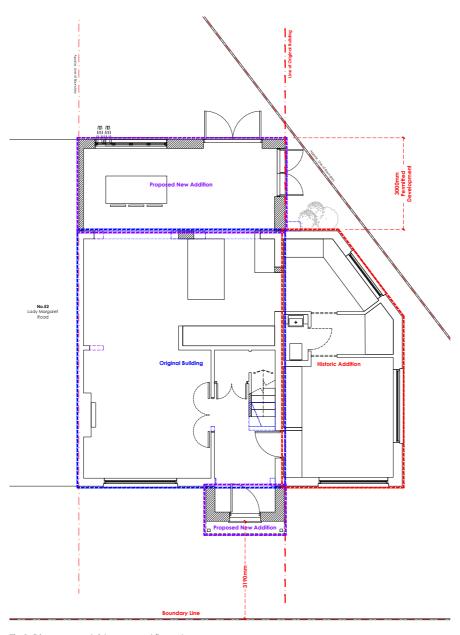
Diagram overlaid on ground floor plan outlining the proposed additions and how they fall within permitted development criteria
